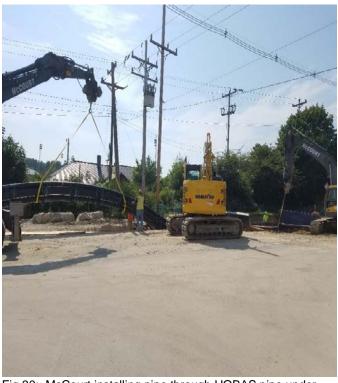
McCourt installing pipe through HOBAS pipe under Main St. Viewing east. (7-31-19).
